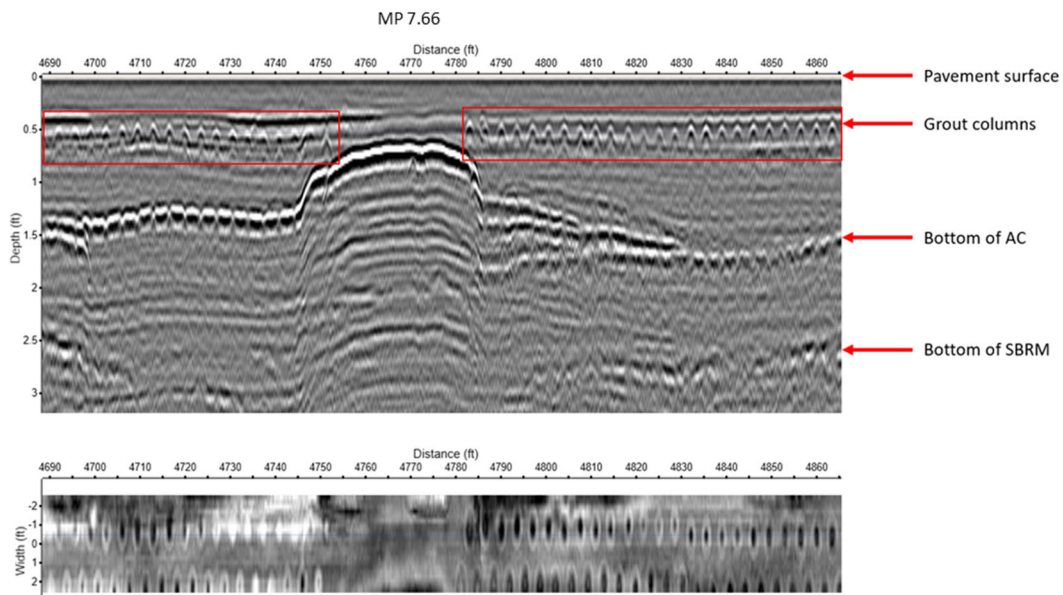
Another example of 3D-Radar data cross-section collected over the through the area with installed grout columns.
